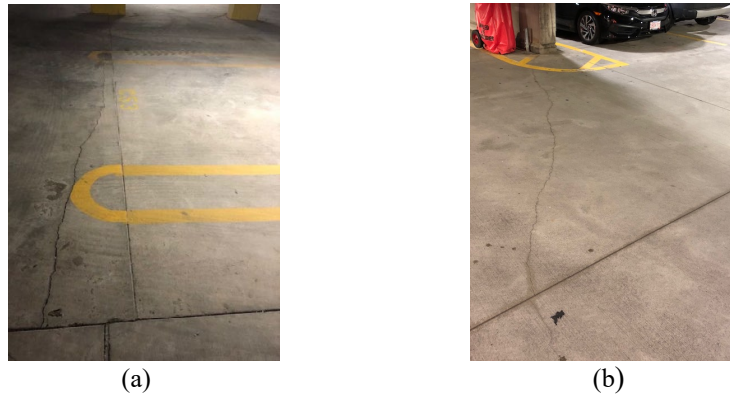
Cracks in slab-on-grade garage floors (a) condominium in NY, (b) shopping mall in Massachusetts.
